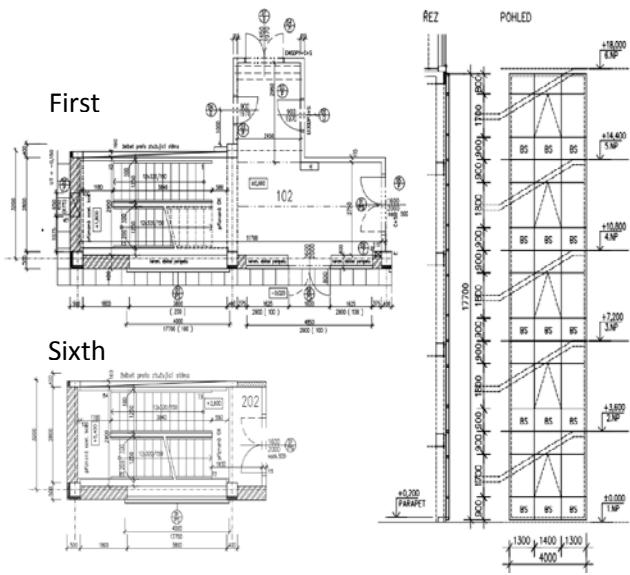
The floor plans for the first and sixth floors, a section of the fire escape stairwell and look at the glass façade of the fire escape [4].
